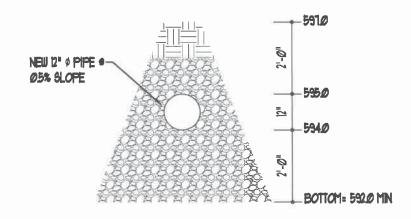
EXISTING OUTLET PIPE ELEVATION DETAIL
